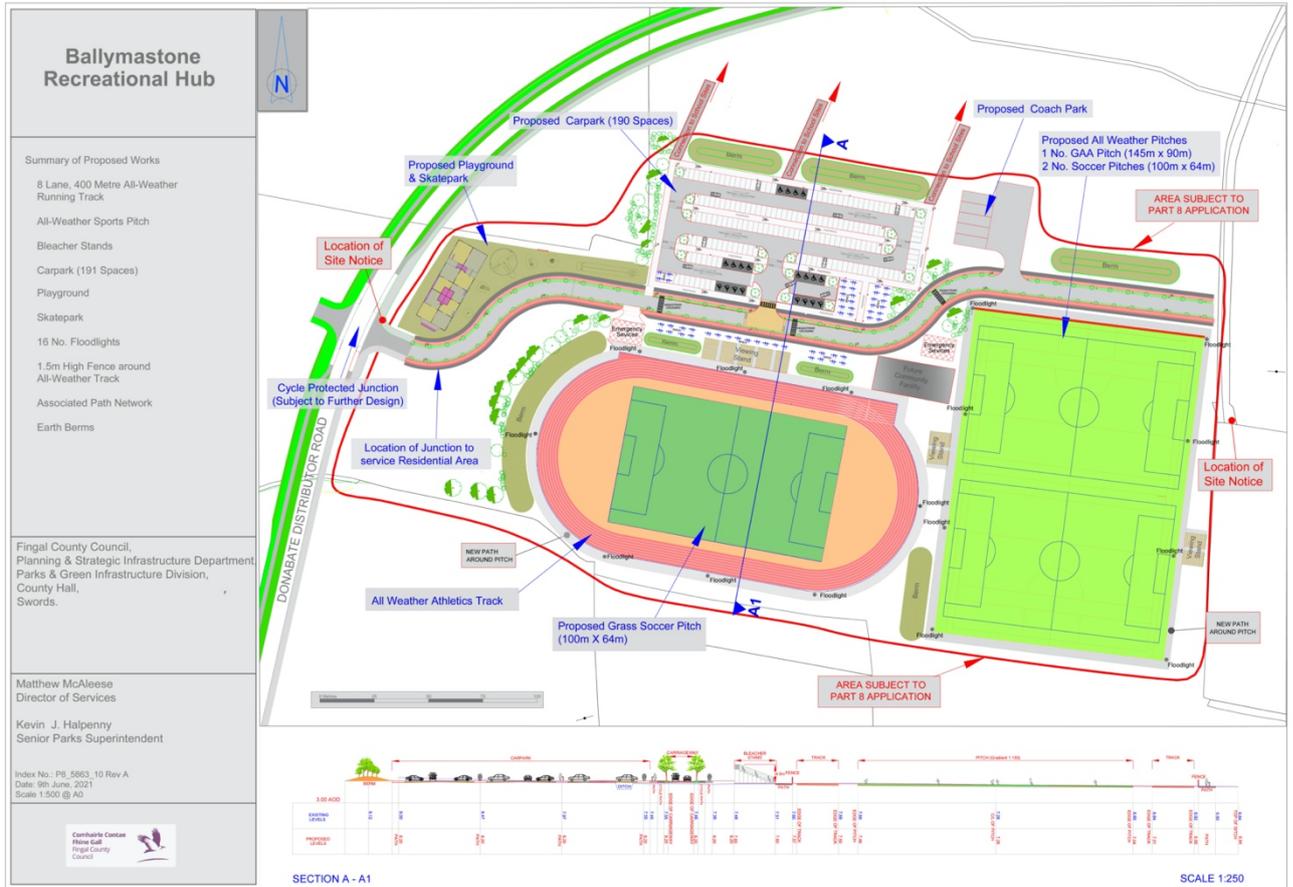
Layout of proposed development site (refer to accompanying documentation for full details)
